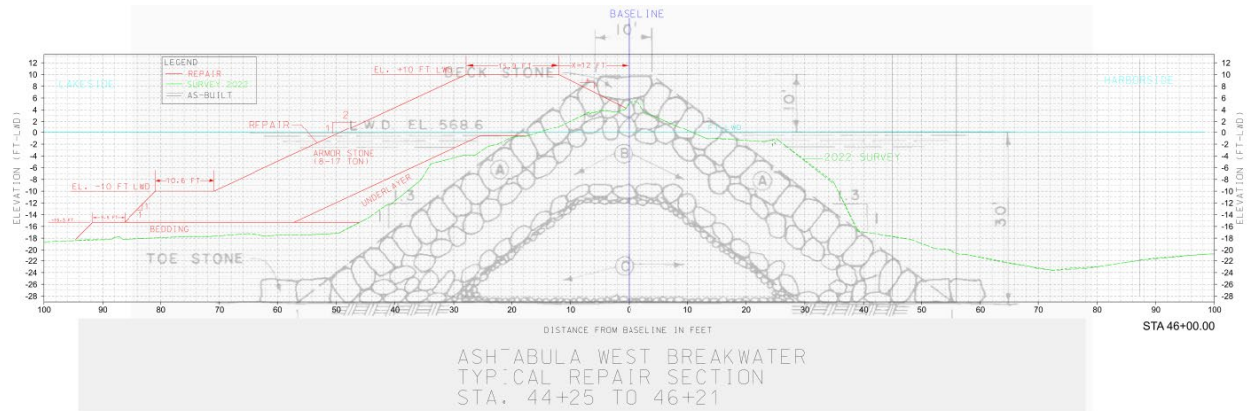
Alternative 2 Typical Repair Cross Section, Zone 4 Stations 44+25 to 46+21.
